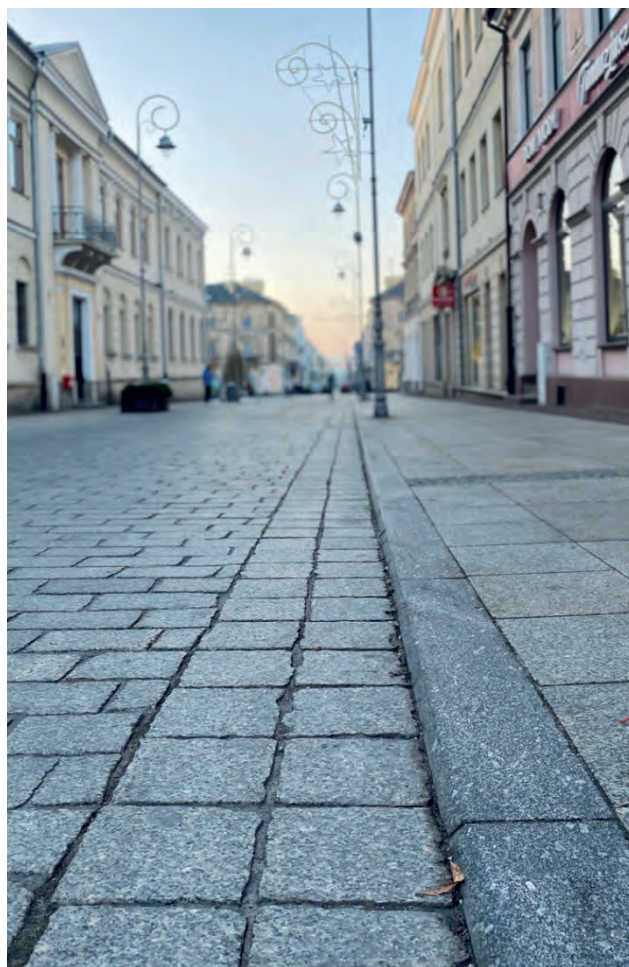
An acceptable transition between a shared zone and a sidewalk using a 2 cm high wedge. Sienkiewicza Street in Kielce. Photo: M. Wijas
